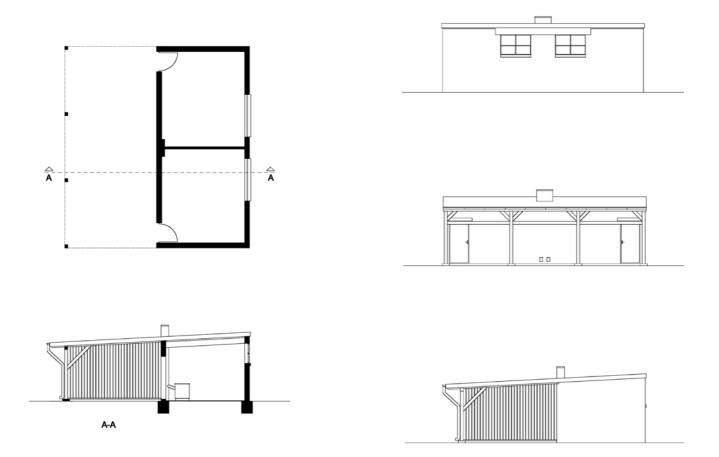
Washhouse 1930, plan 2006, Bauhaus Dessau Foundation
